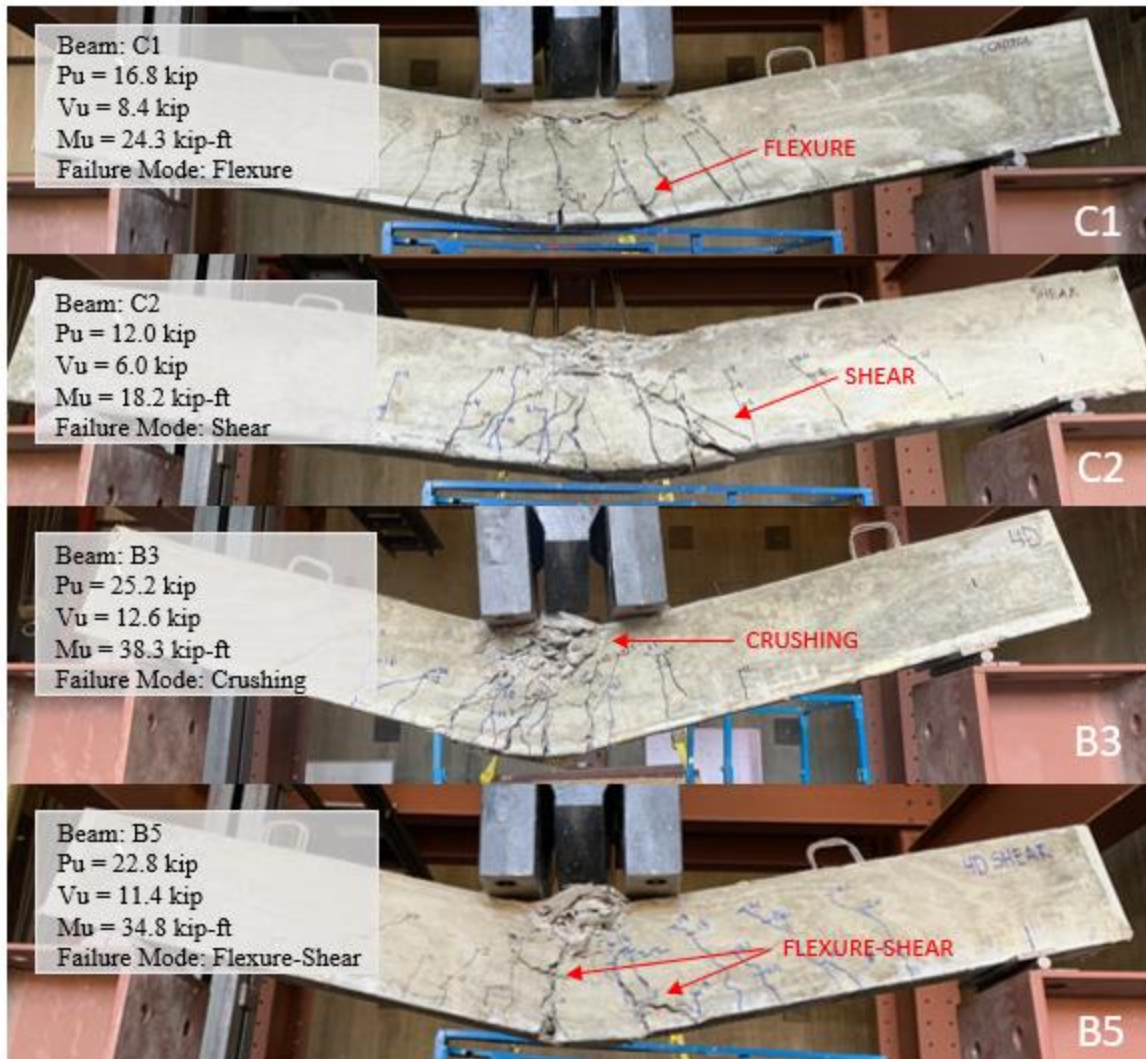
Failure Modes of Beams C1, C2, B3, and B5
